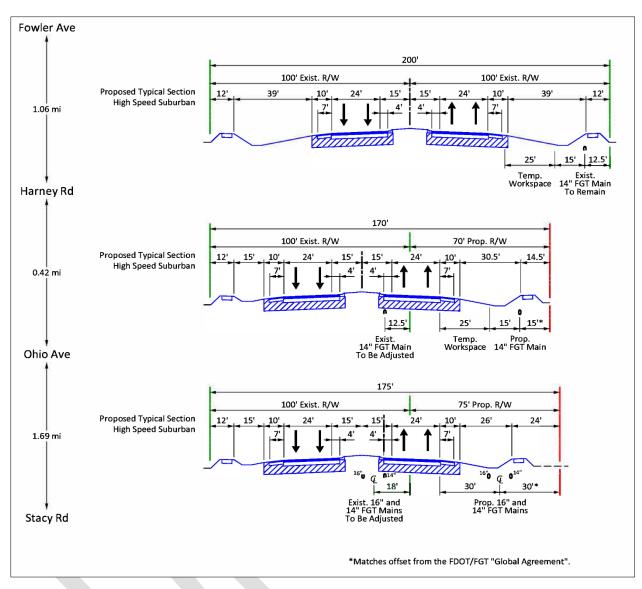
East-Side Widening Alternative from Fowler Avenue to Stacy Road
